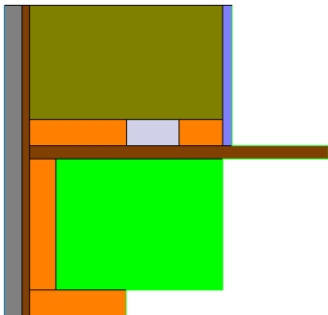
Double Stud Wall Rim Joist Section Case 8a
